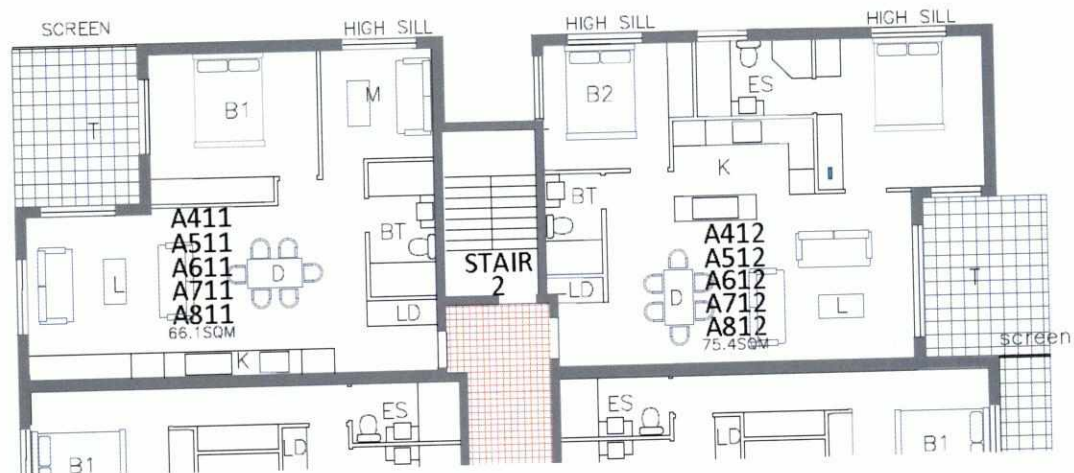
Extract of the proposed 'Building A Level 4 - 8 Plan' which demonstrates the proposed measures in response to the reduced building separation.
